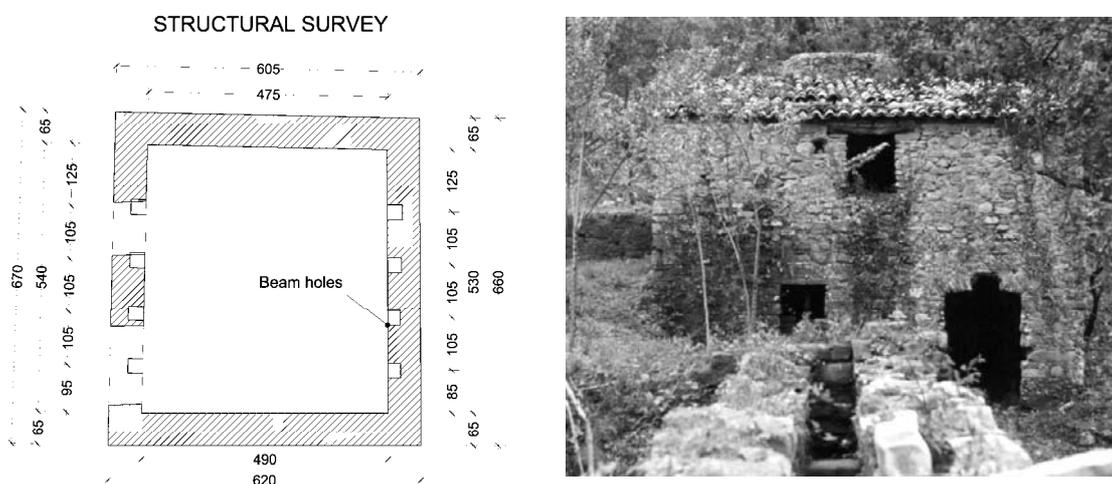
The mill masonry structure namely “Mill B” located in Perdifumo.
